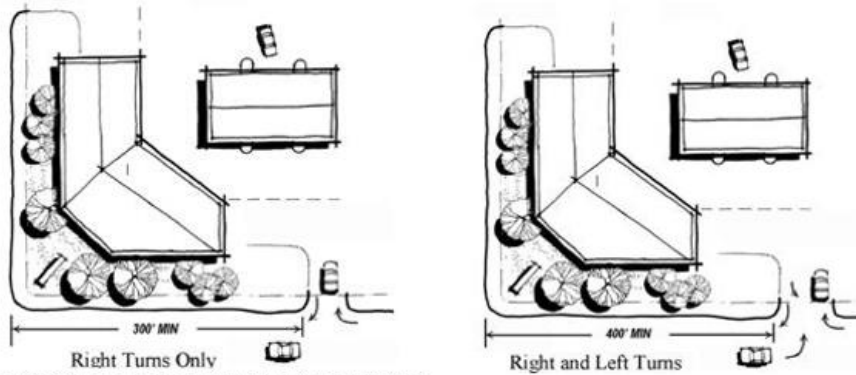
C.3.B: DRIVEWAY DISTANCE FROM INTERSECTION
